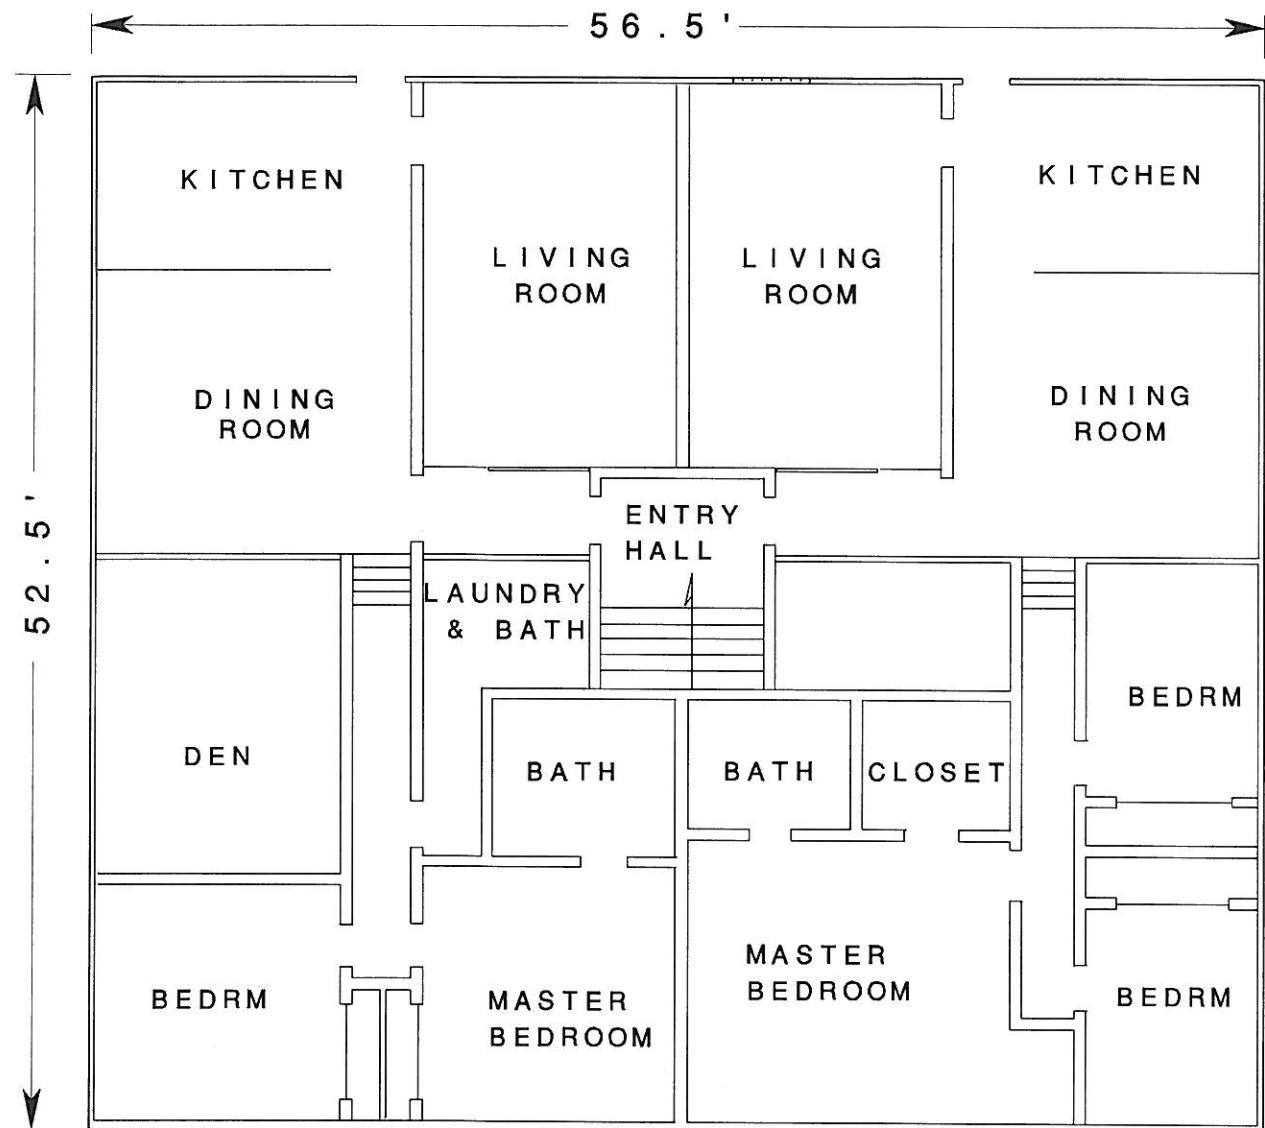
Floor plan of the upper levels – three bedroom apartments
